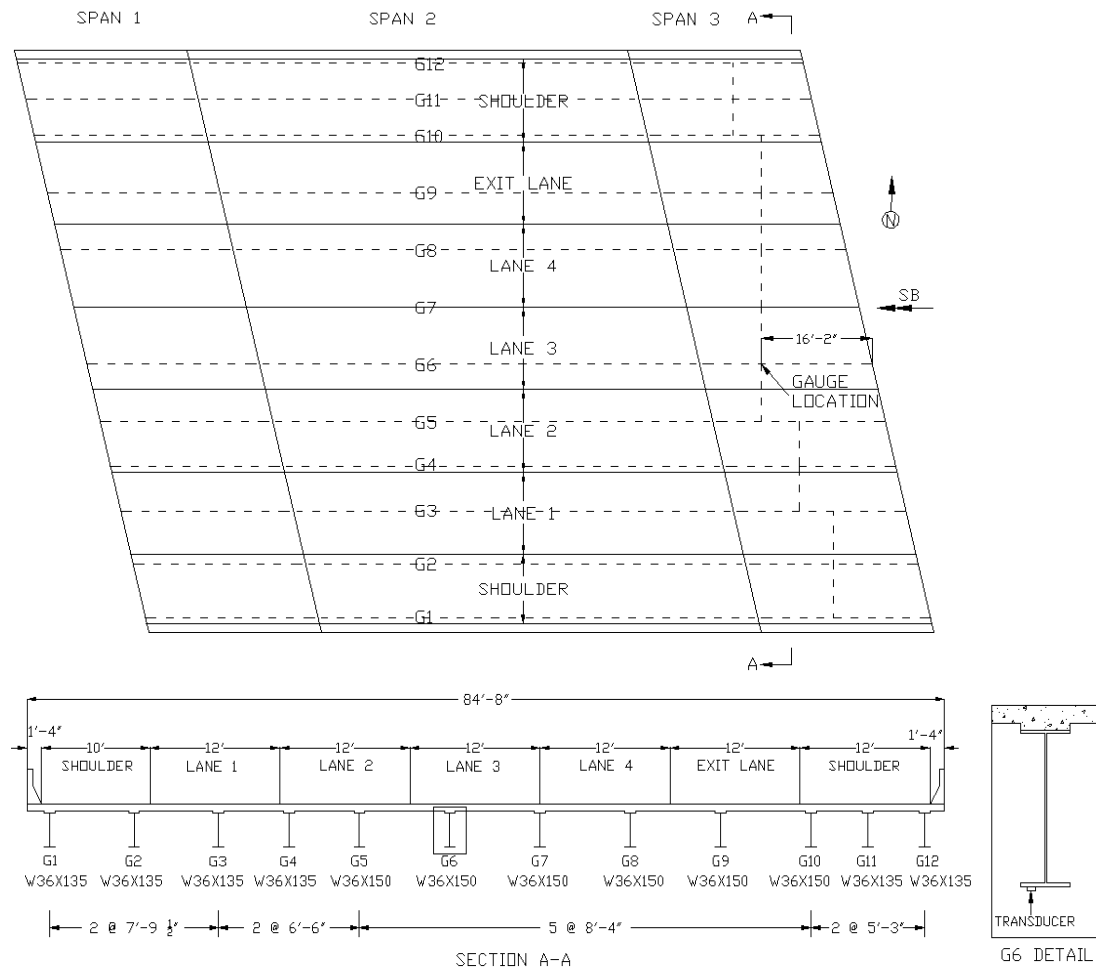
Bridge 1-704 plan, Span 3 cross-section and Girder 6 detail
